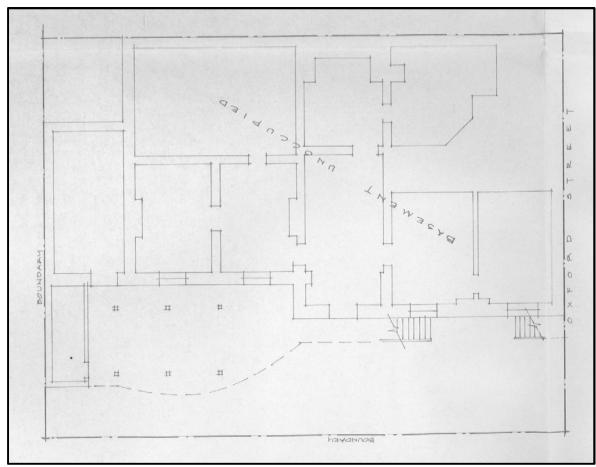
The floor plan of the basement (Hall & Mackenzie 1999).
